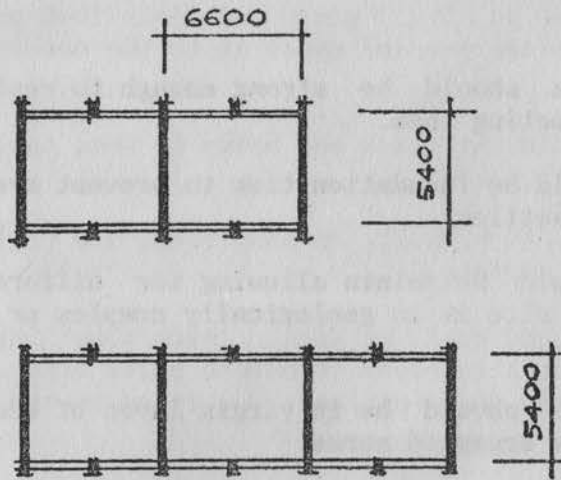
Classrooms should be in lines of 2 or 3 classrooms only.
